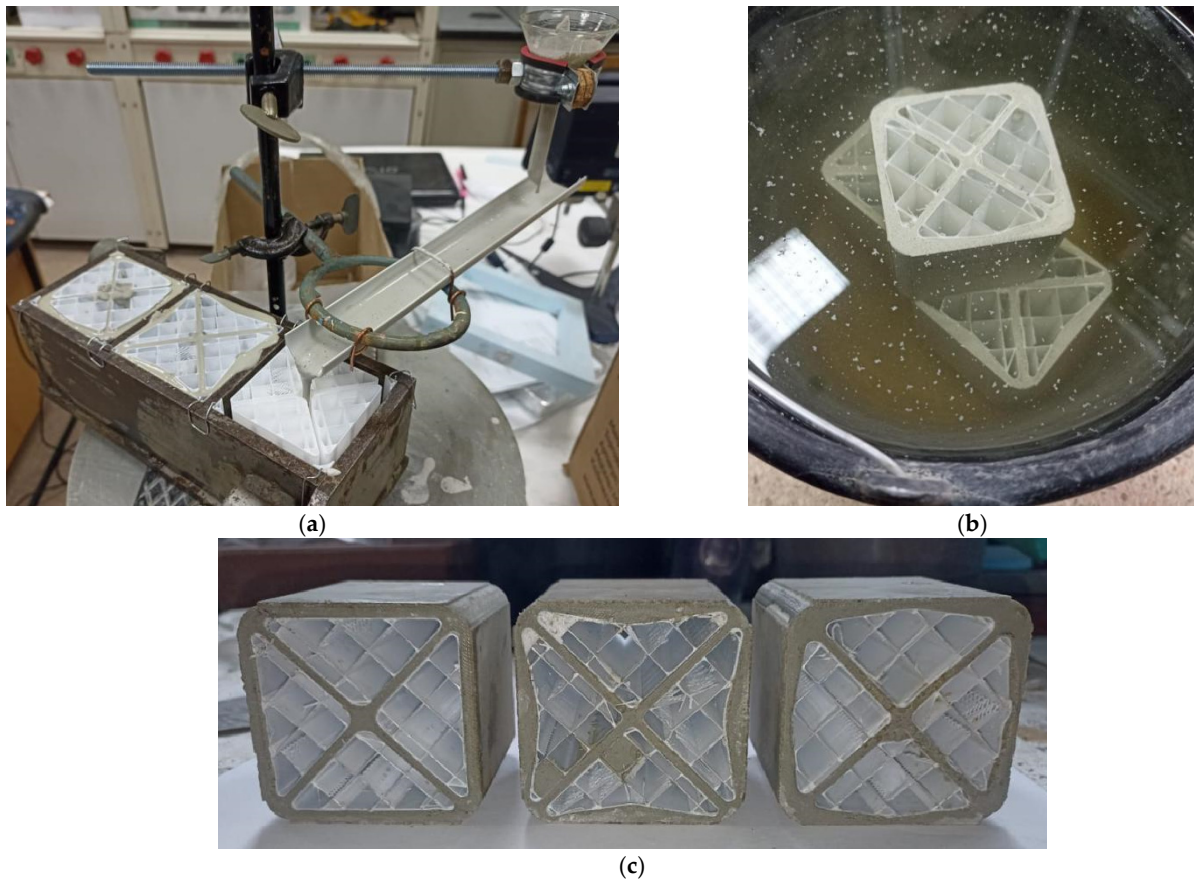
Molding and subsequent consolidation of hollow concrete blocks: (a)—pouring concrete mixture into the mold; (b)—hardening of samples in water; (c)—hardened samples ready for testing.
